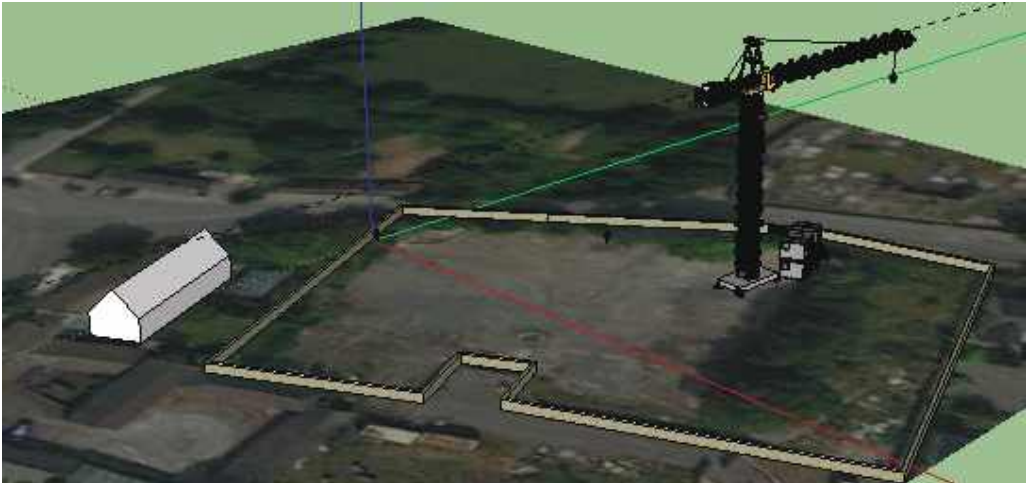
A typical site organization and layout drawn over the Google Earth image.
